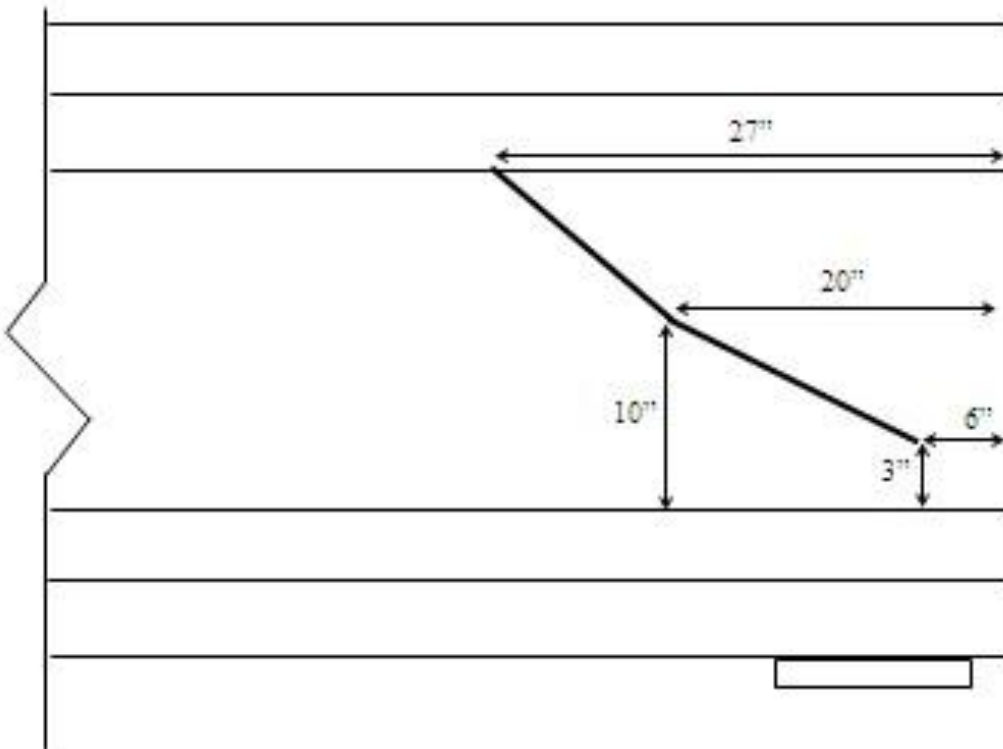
Crack diagram for south span girder, 3rd beam from west side, west face, south abutment (#7933).
